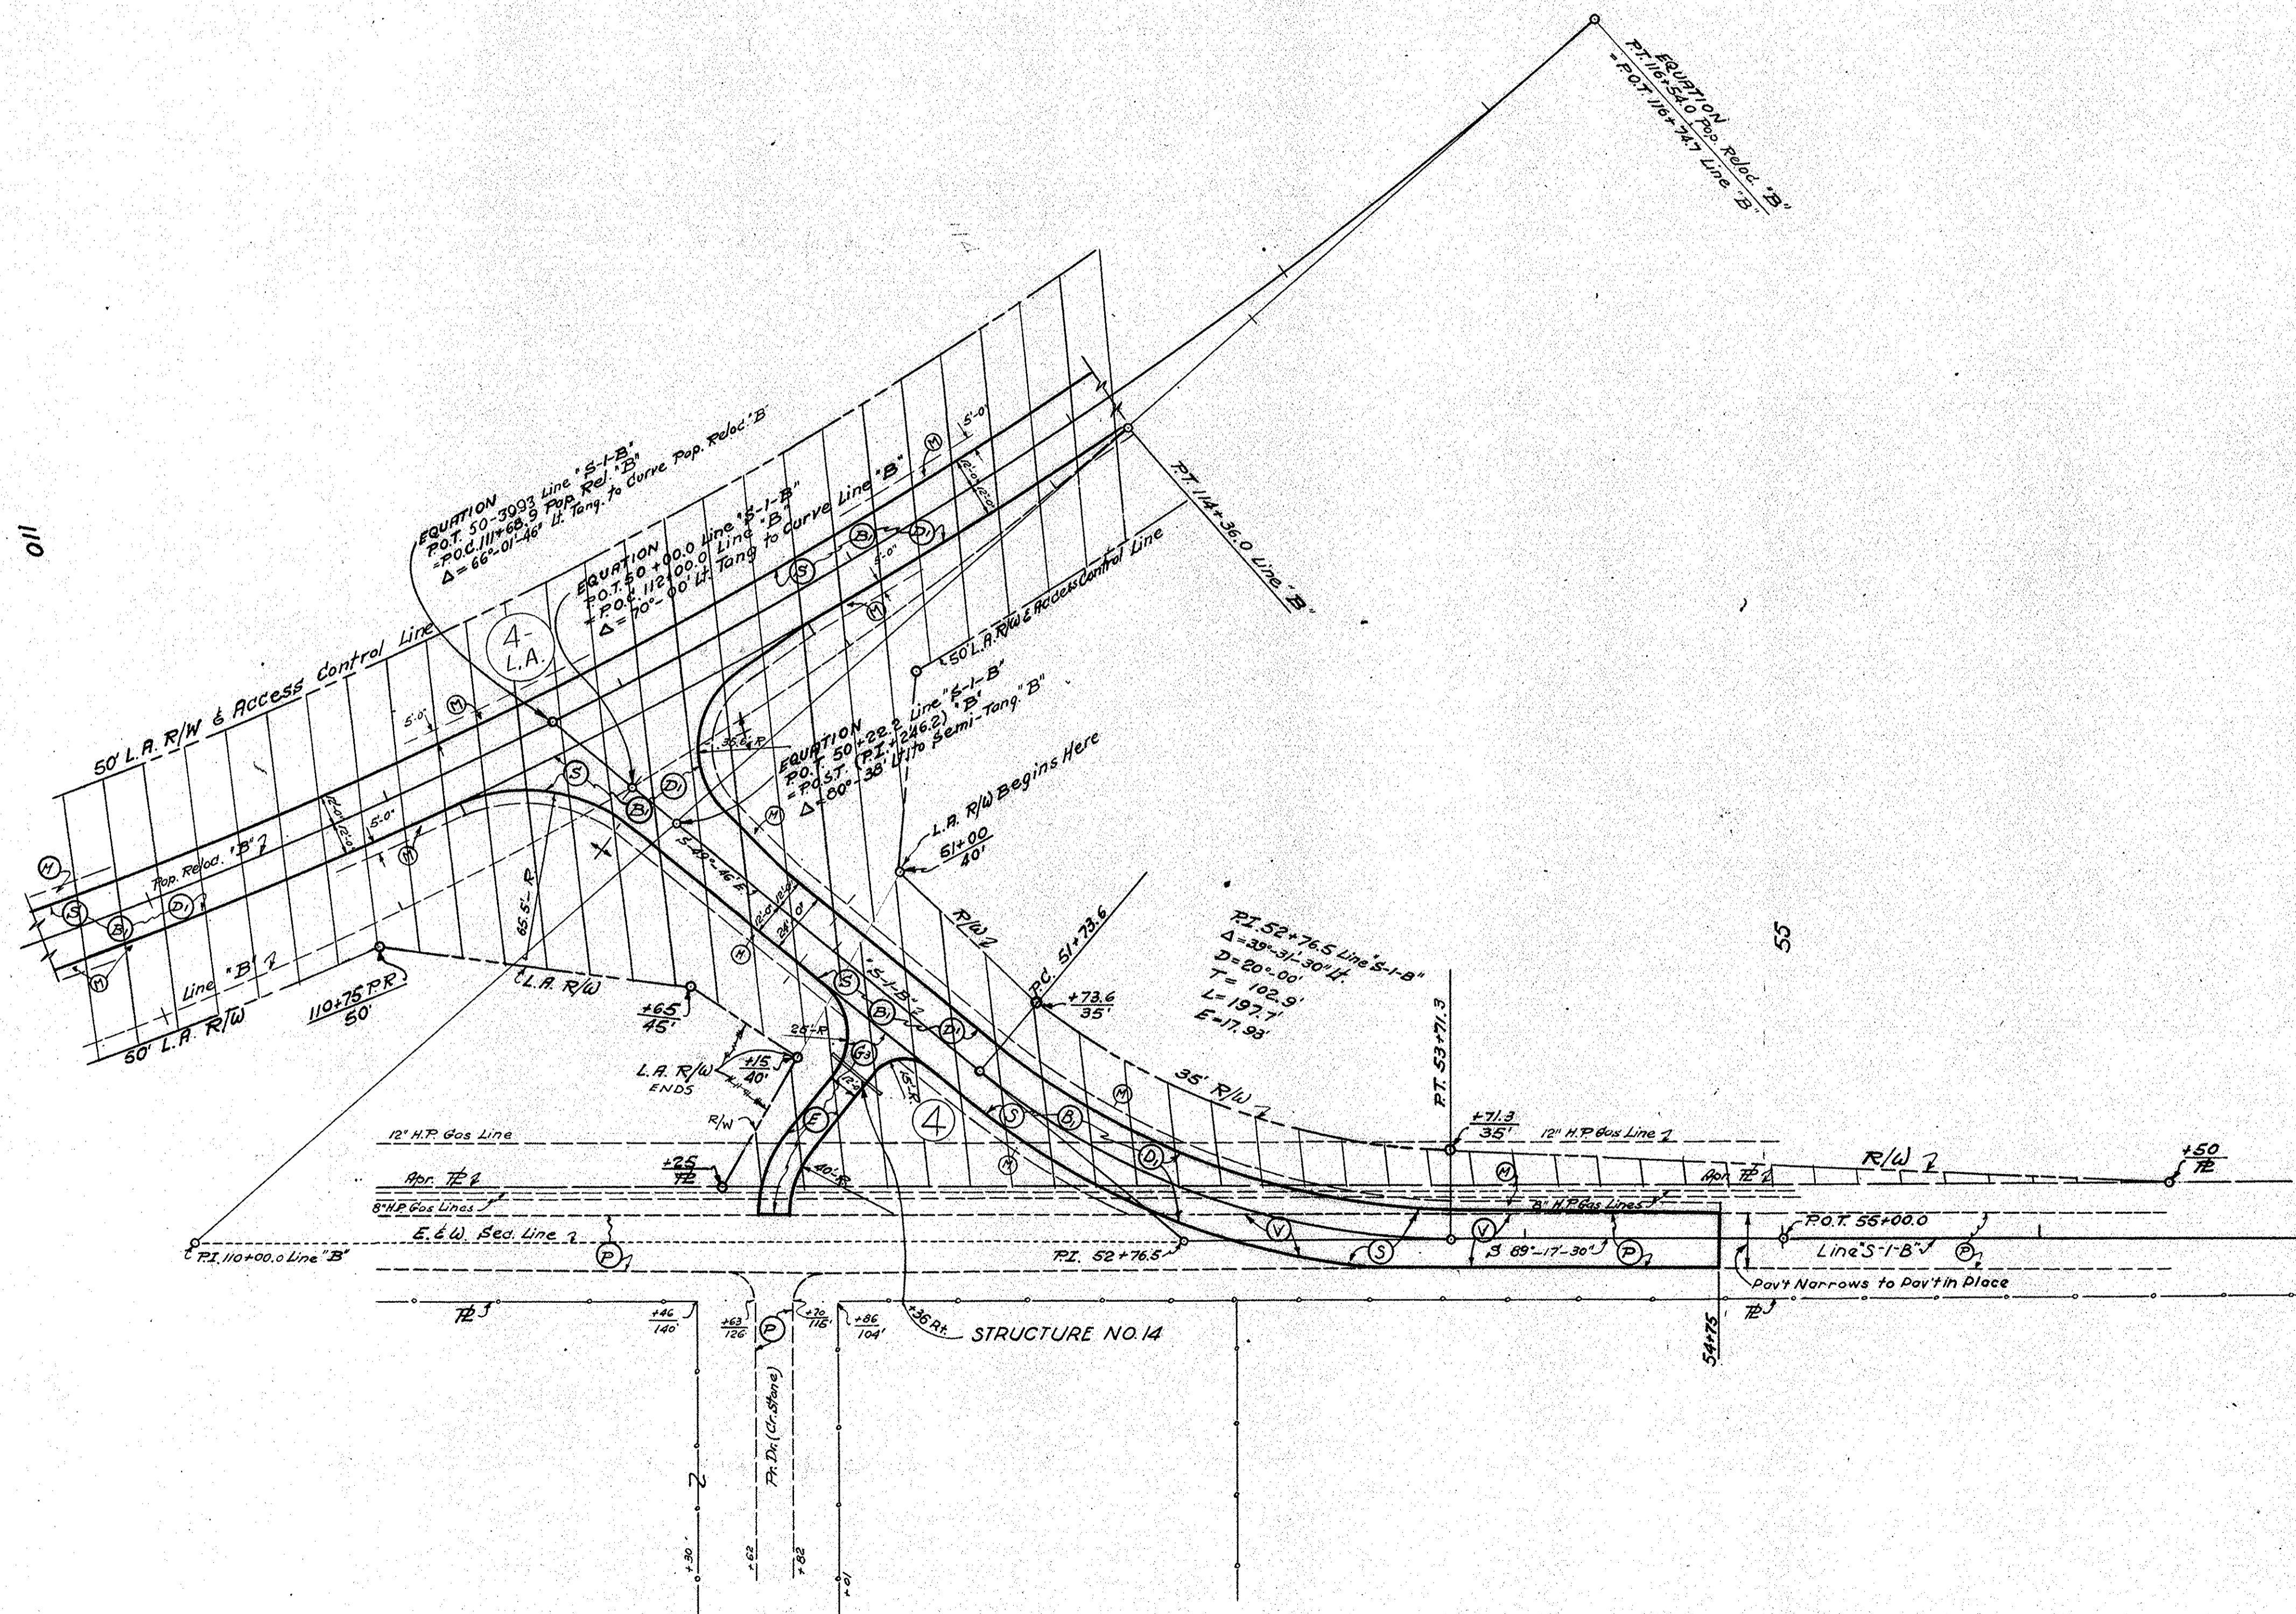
PLAN - PROFILE O. P. R. & E. STANDARD
